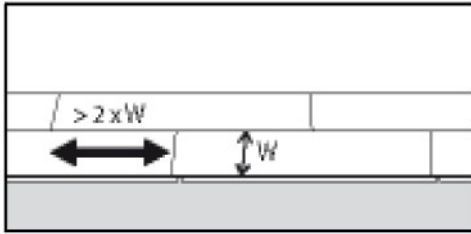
NOTE: The short ends of the planks in parallel rows must be staggered a minimum of two times the width of the plank. For example, if the plank is 7" wide, the length of the plank stagger needs to be a minimum of 14".
